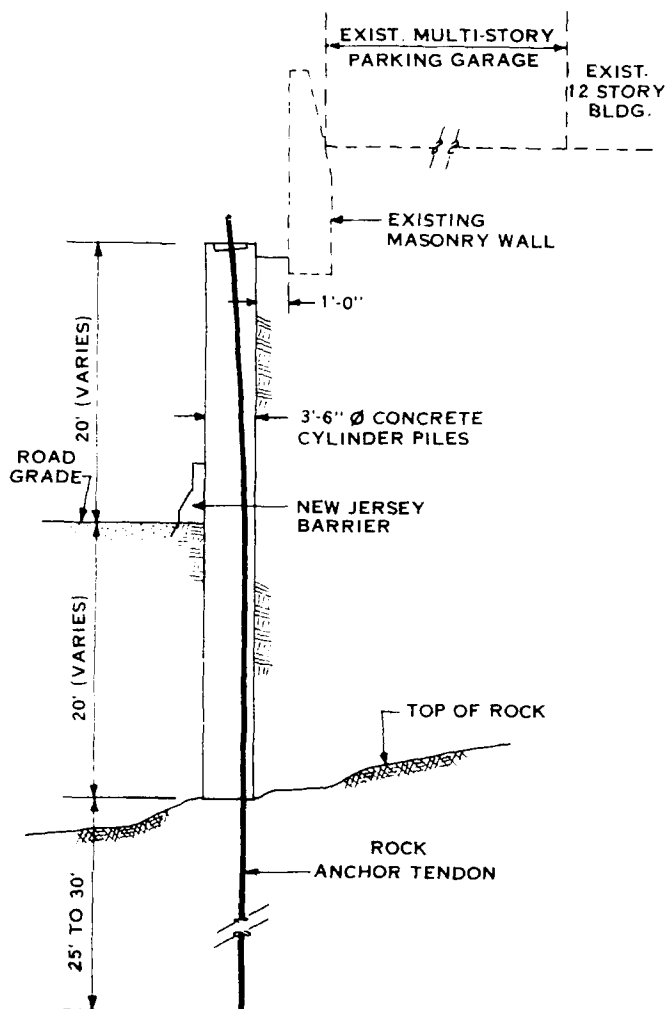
POST-TENSIONED CAISSON RETAINING WALL
